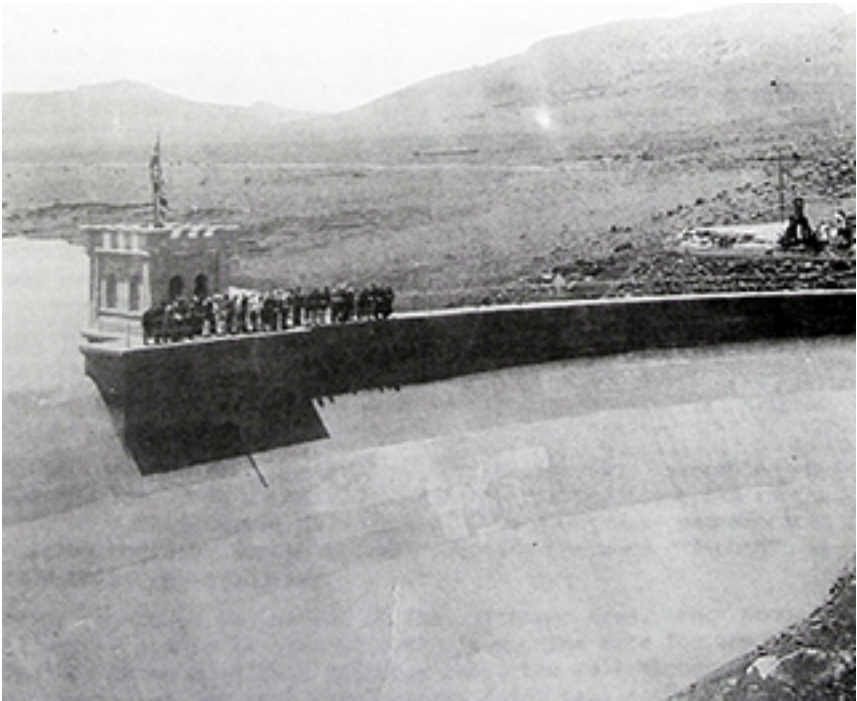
Opening of Bongolo Dam in Queenstown. (Greaves, 1987)
